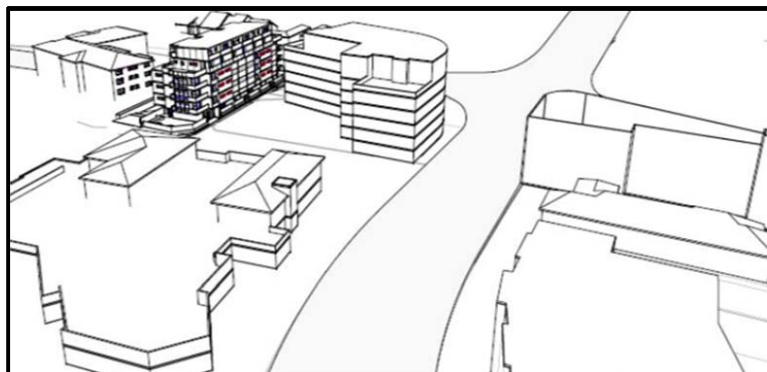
View from east looking west along Liverpool Road. Eastern façade of the building stepped to allow solar access to the south in the morning. Close to 15m separation is provided at the upper level and the RFB to the south. Note original image shows two level DA flat building scheme and the revised scheme adopts a boarding house typology with reduced bulk and scale. The overall form is very similar to the recently approved flat building scheme by the LPP on the 13th Oct 2021.
